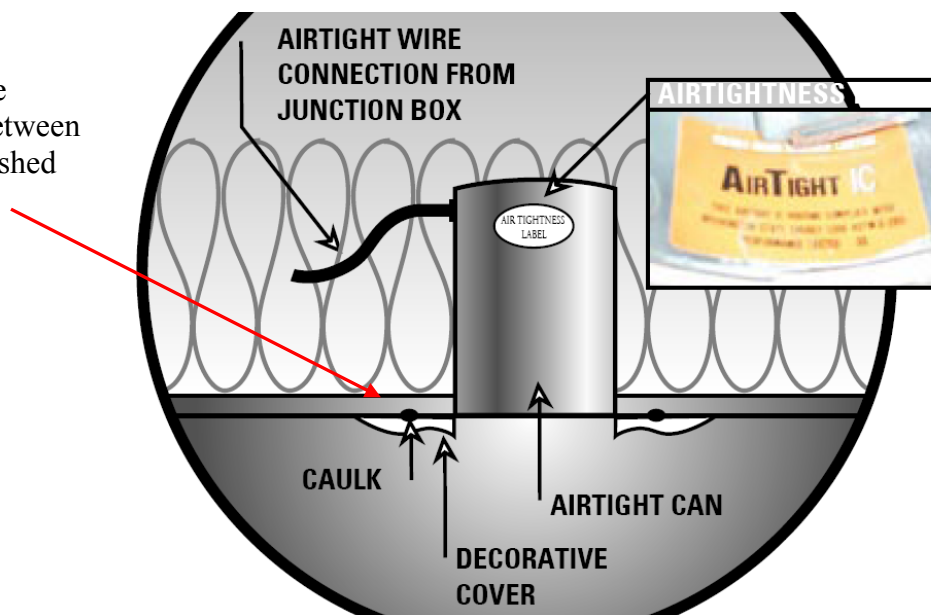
Illustration of Proper Air Sealing at Recessed Fixtures
